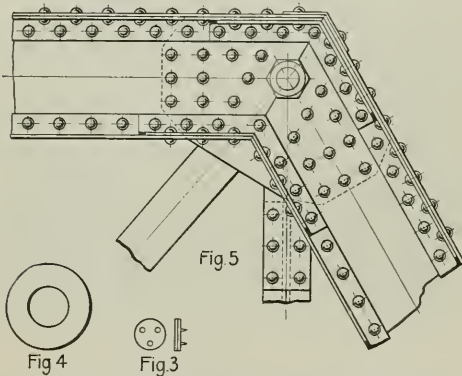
Horn Center, Figs. 4 and 5, Examples of Shading.
